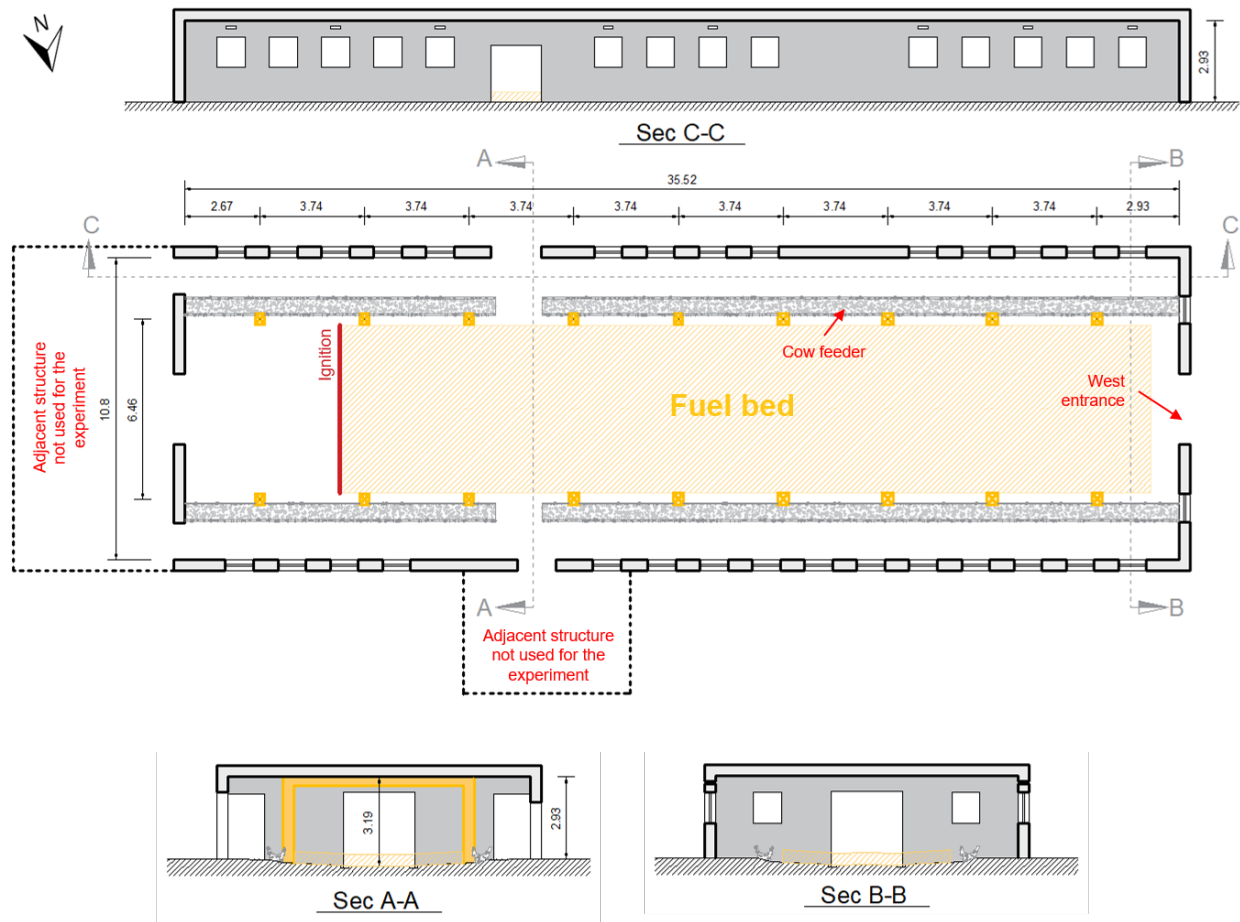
Floor plan and sections of the compartment used for x-ONE [15] and x-TWO experiments.
